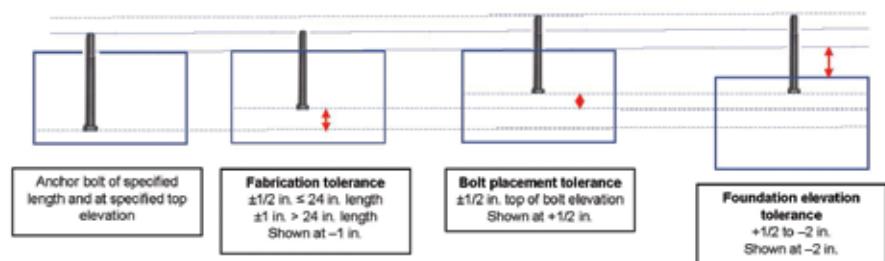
Illustration of the tolerances (marked with red arrows) for fabrication, bolt elevation placement, and foundation elevation placement. These tolerances are combined to determine the embedded bolt length
